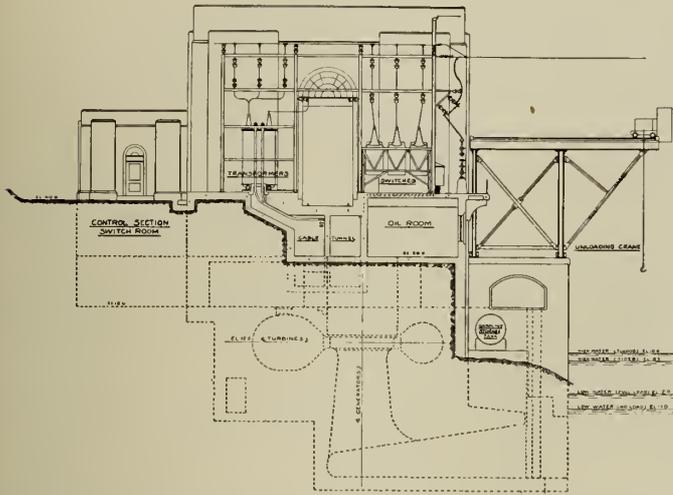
Sectional Elevation, Transformer and Switching Station.
